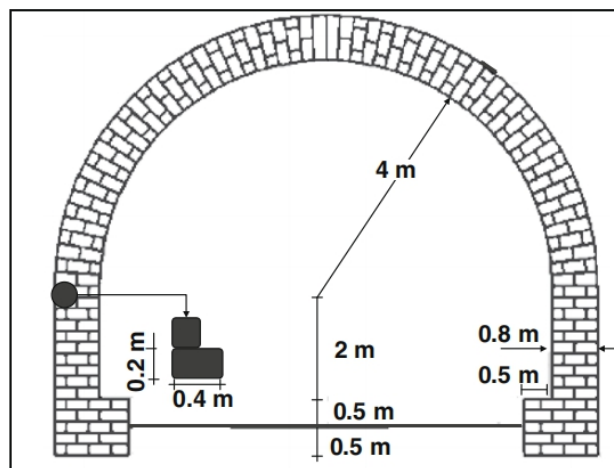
Masonry arch structure generated using DEM (Idris et al., 2009)
